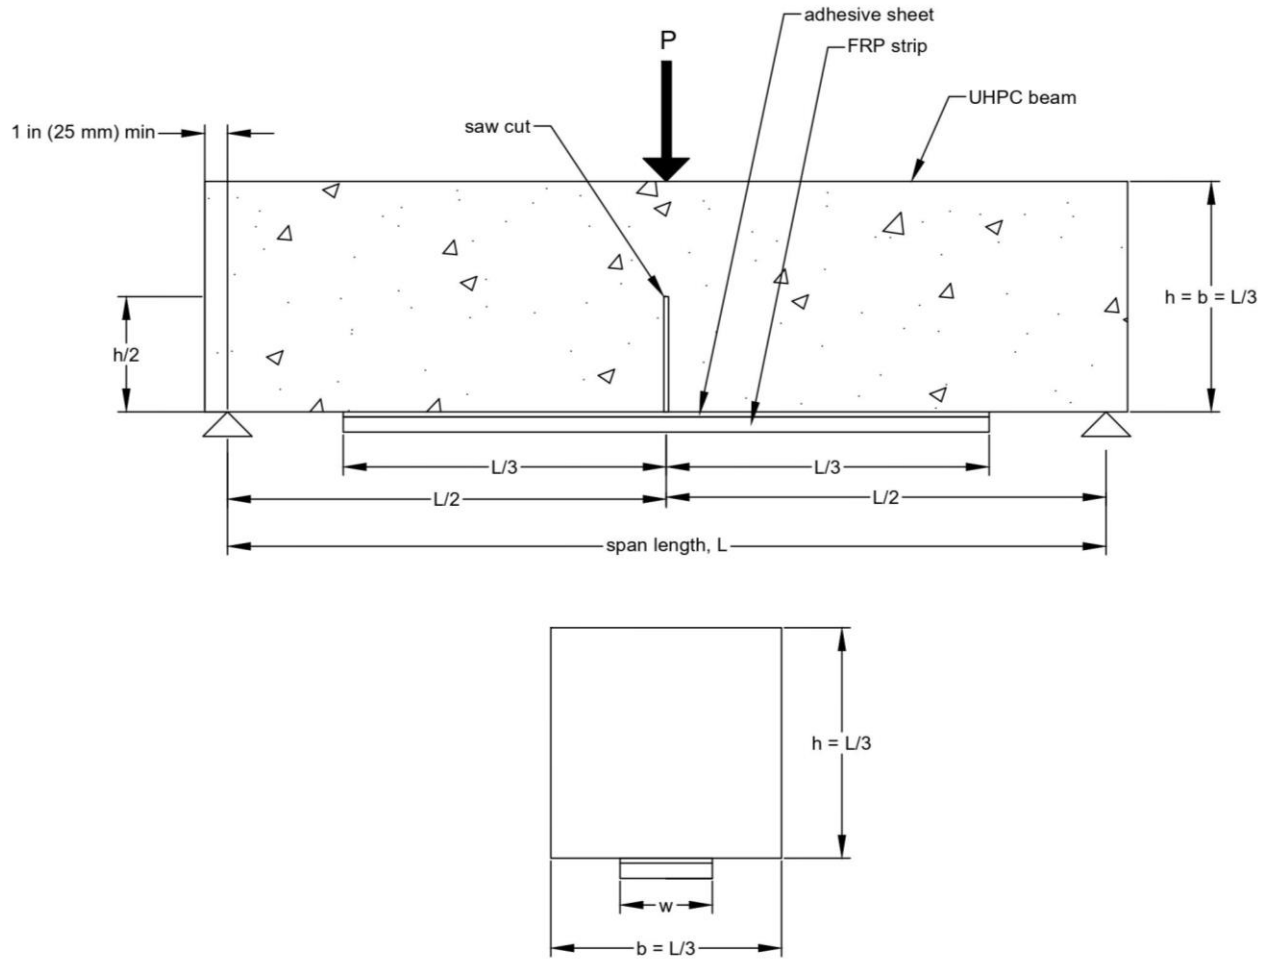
Proposed future three-point bending setup developed by Gartner et al.
